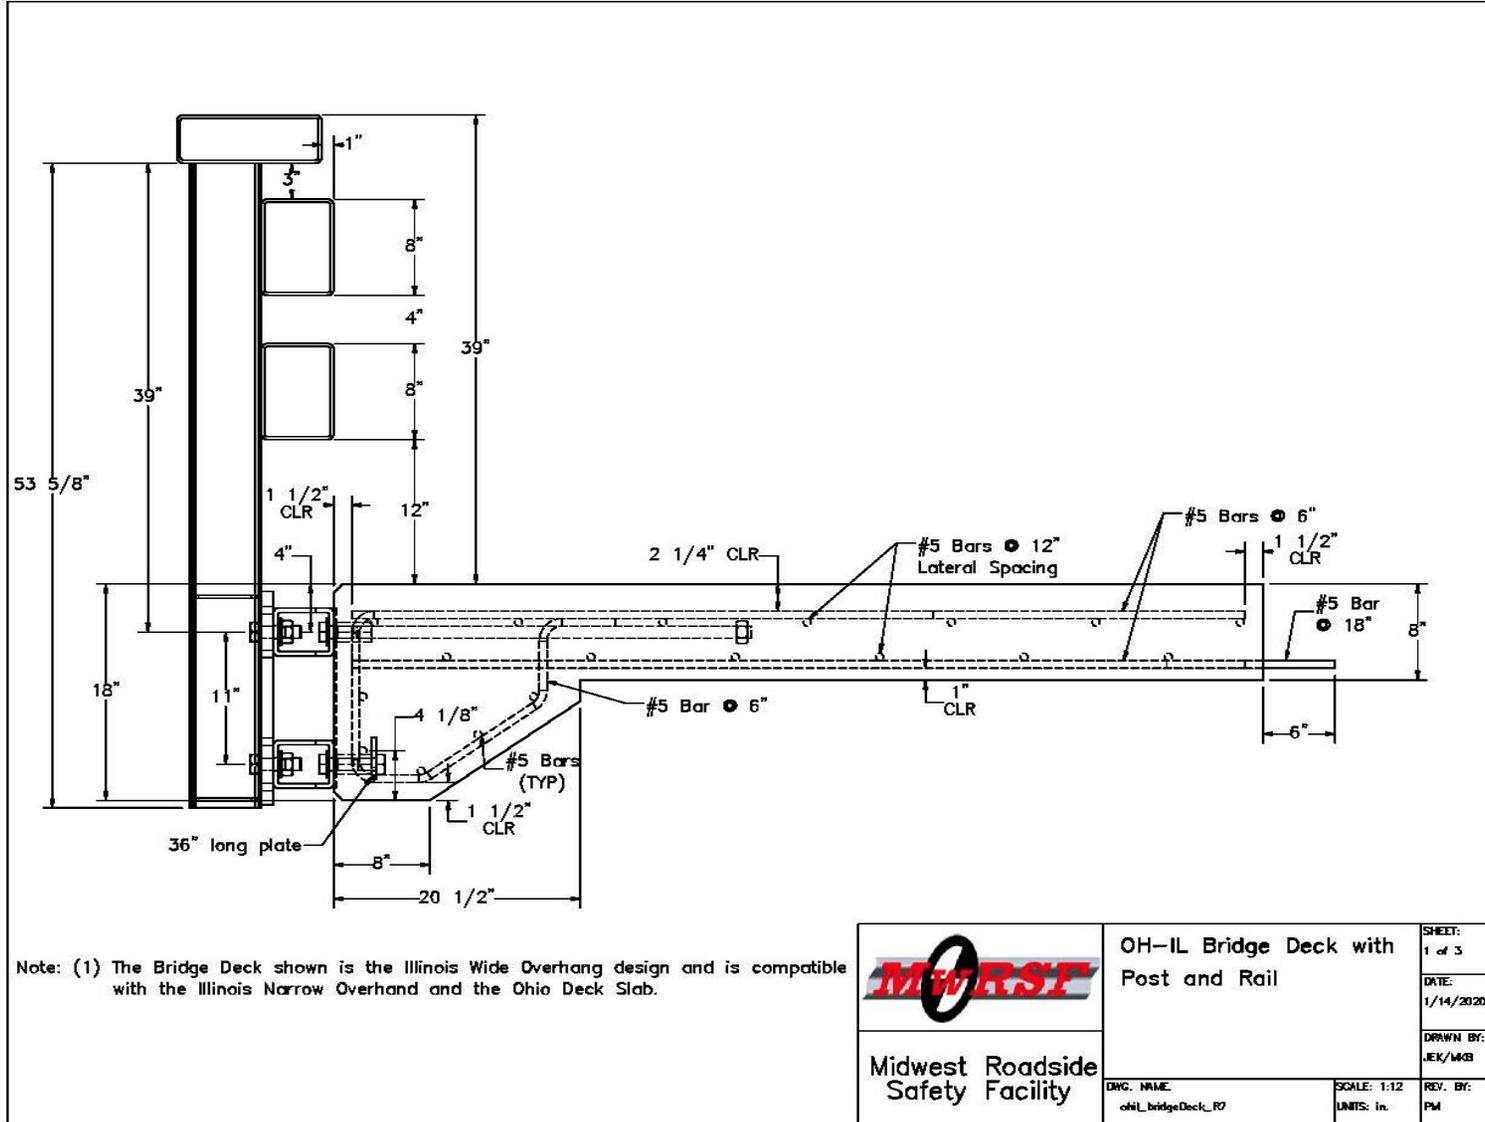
Typical Slab Deck Reinforcement Configuration without Future Overlay
